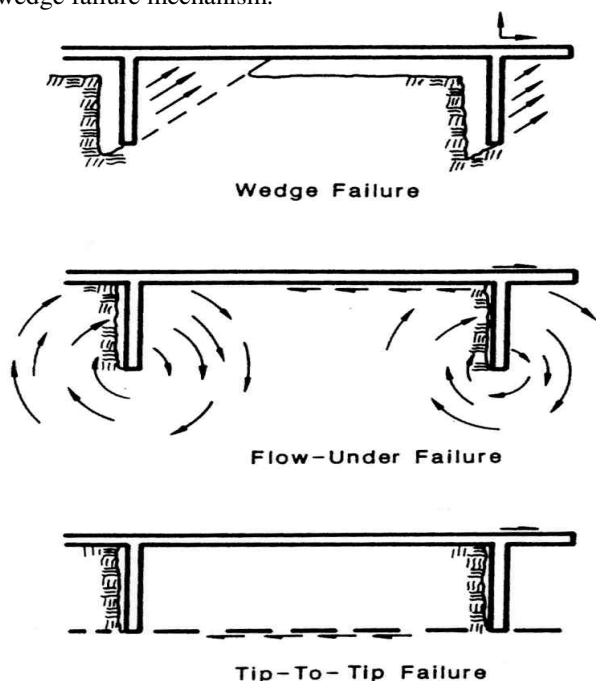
Failure mechanisms for shallow foundations with lateral loading.
